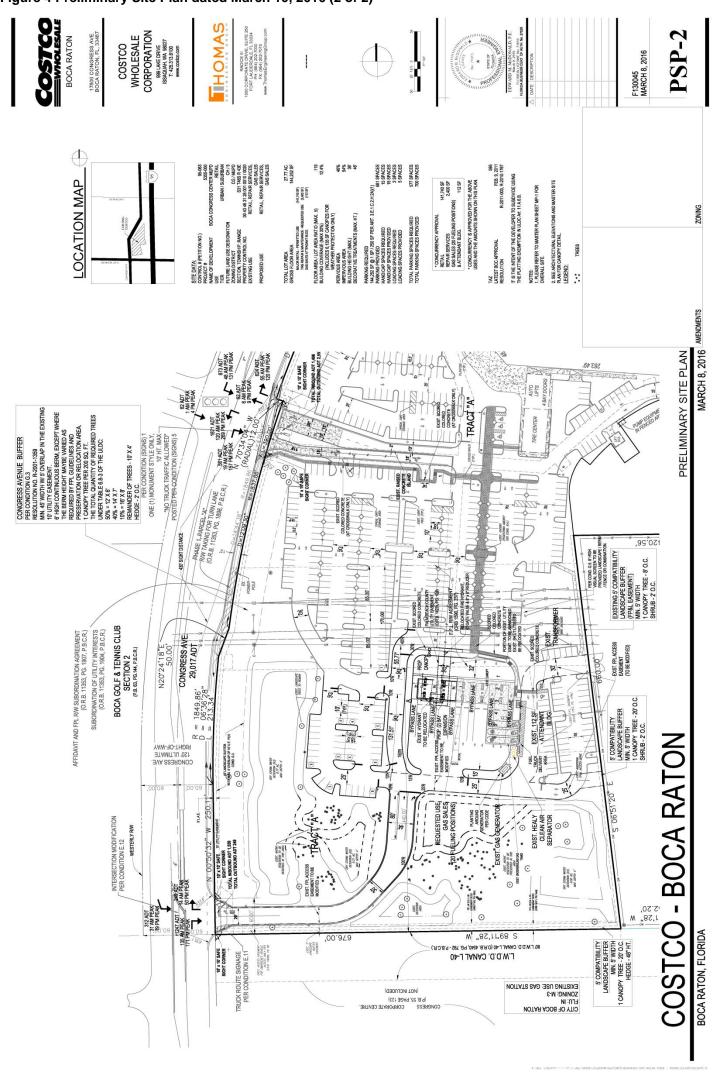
Preliminary Site Plan dated March 10, 2016 (1 of 2)
